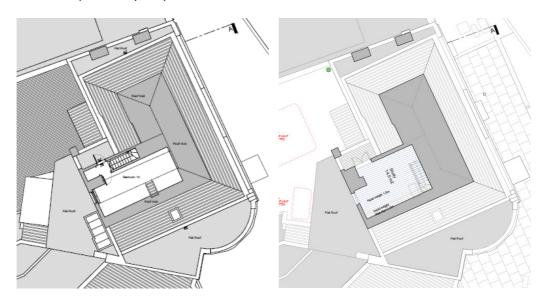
Existing (L) and proposed (R) third floor plans
